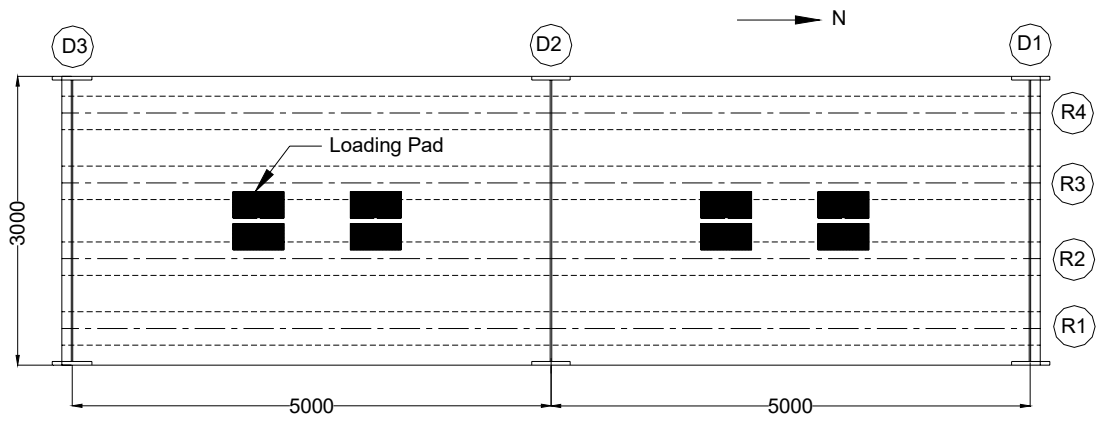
Specimen 1: Plan View with Rib and Diaphragm Designs
